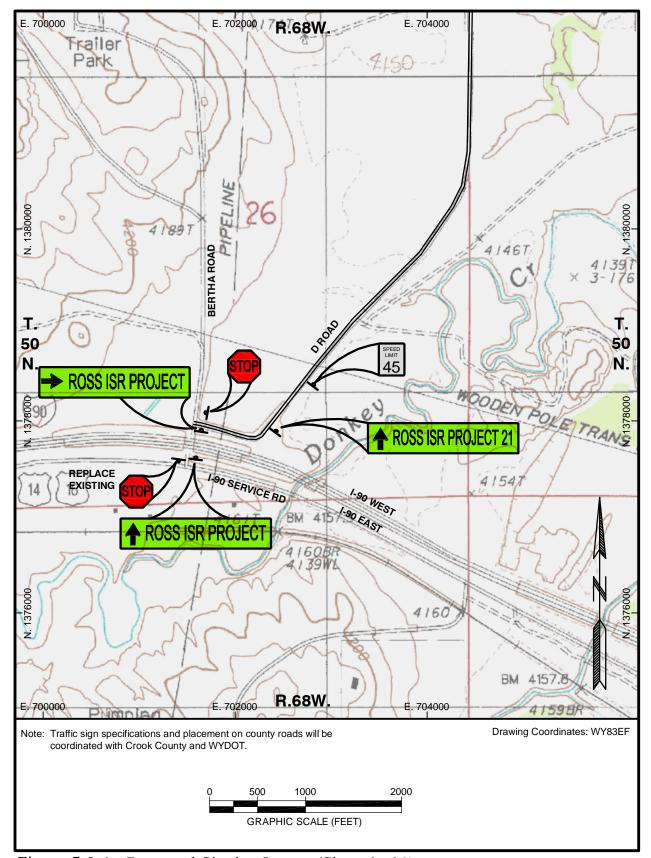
Proposed Signing Layout (Sheet 1 of 3)
